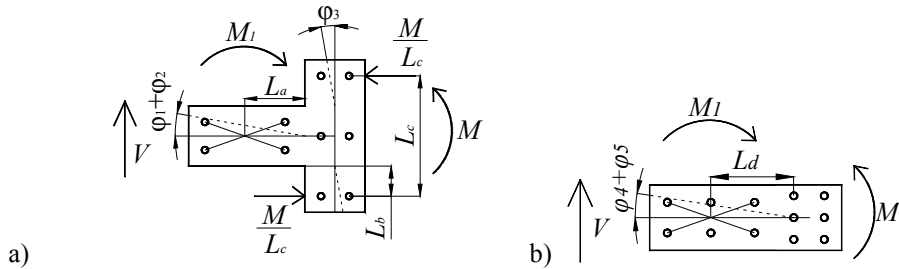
Rotational scheme and marking of a) T form gusset plate;
